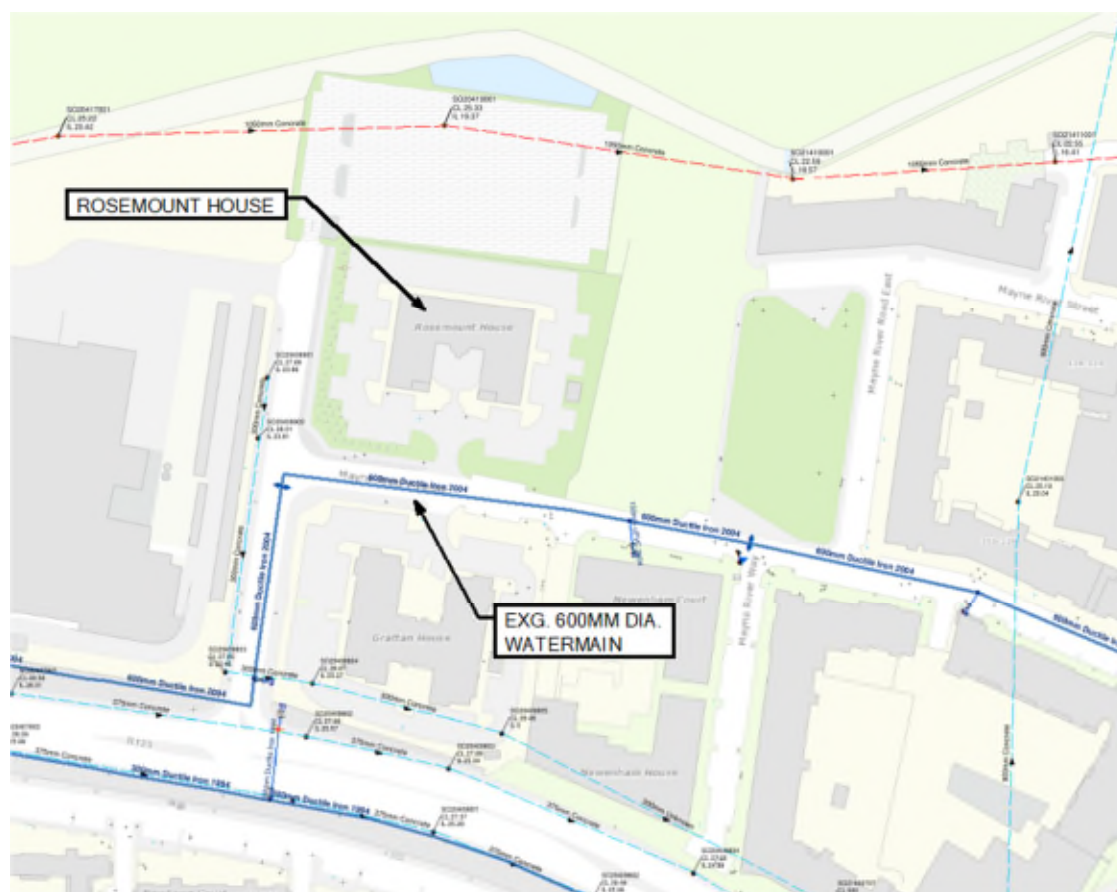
Extract from Irish Water Network Plan – Existing Watermains
